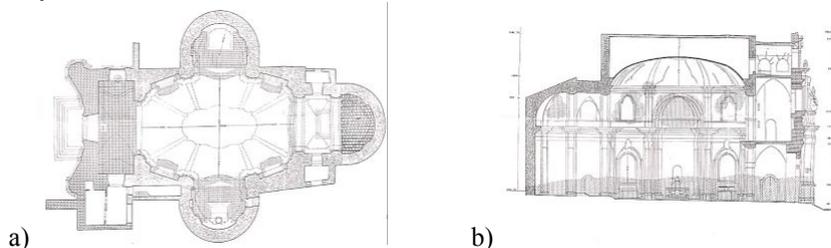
Madonna del Carmine Church: floor plan (a) and longitudinal section (b).
